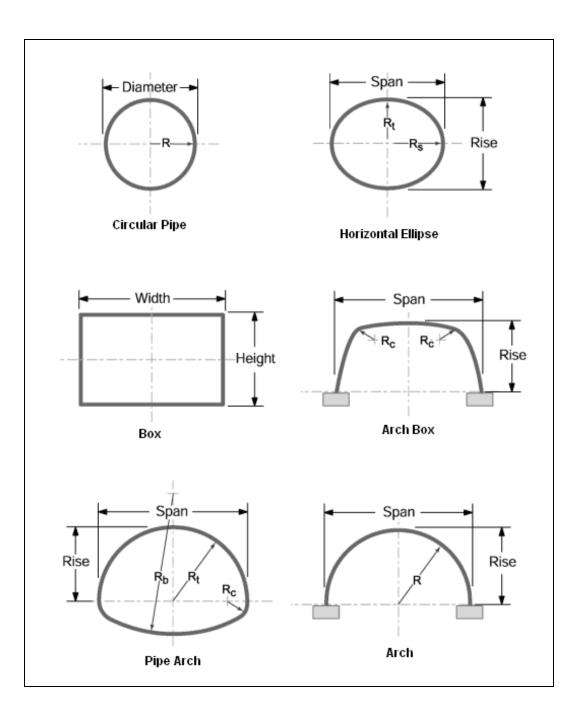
Culvert Shapes (Modified USFS 2006)
